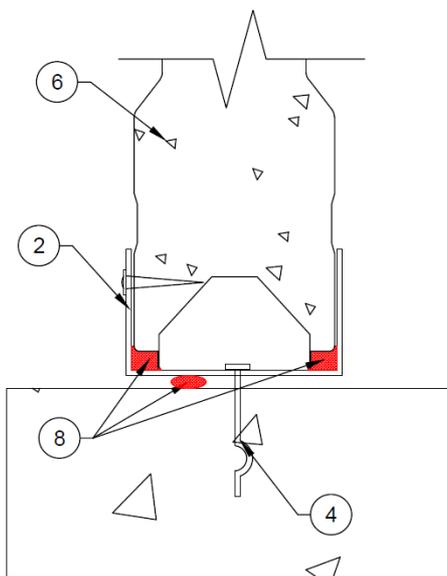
Bottom Detail for Horizontal Speedpanel Wall
